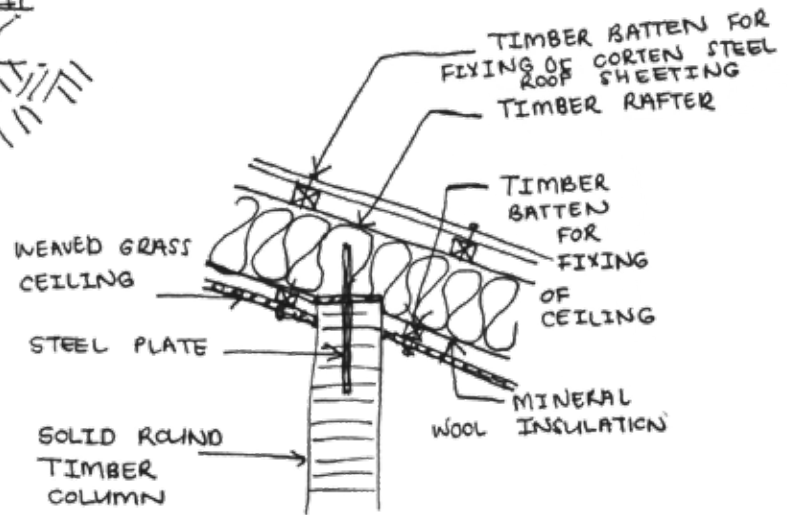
Timber Construction: Roof (Caldeira, 2019: drawing).
